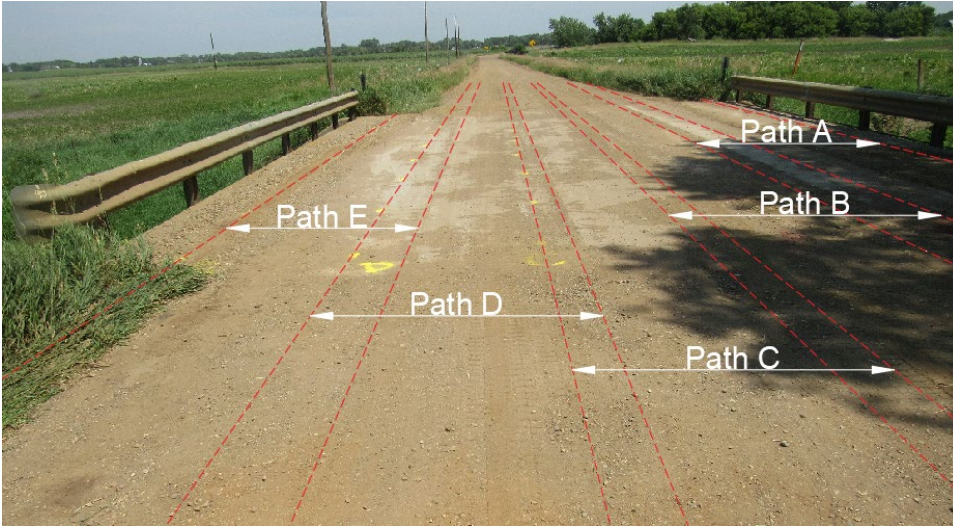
Photograph of Truck Paths for 23-in. (584-mm) Deep Double-Tee Girder Bridge
